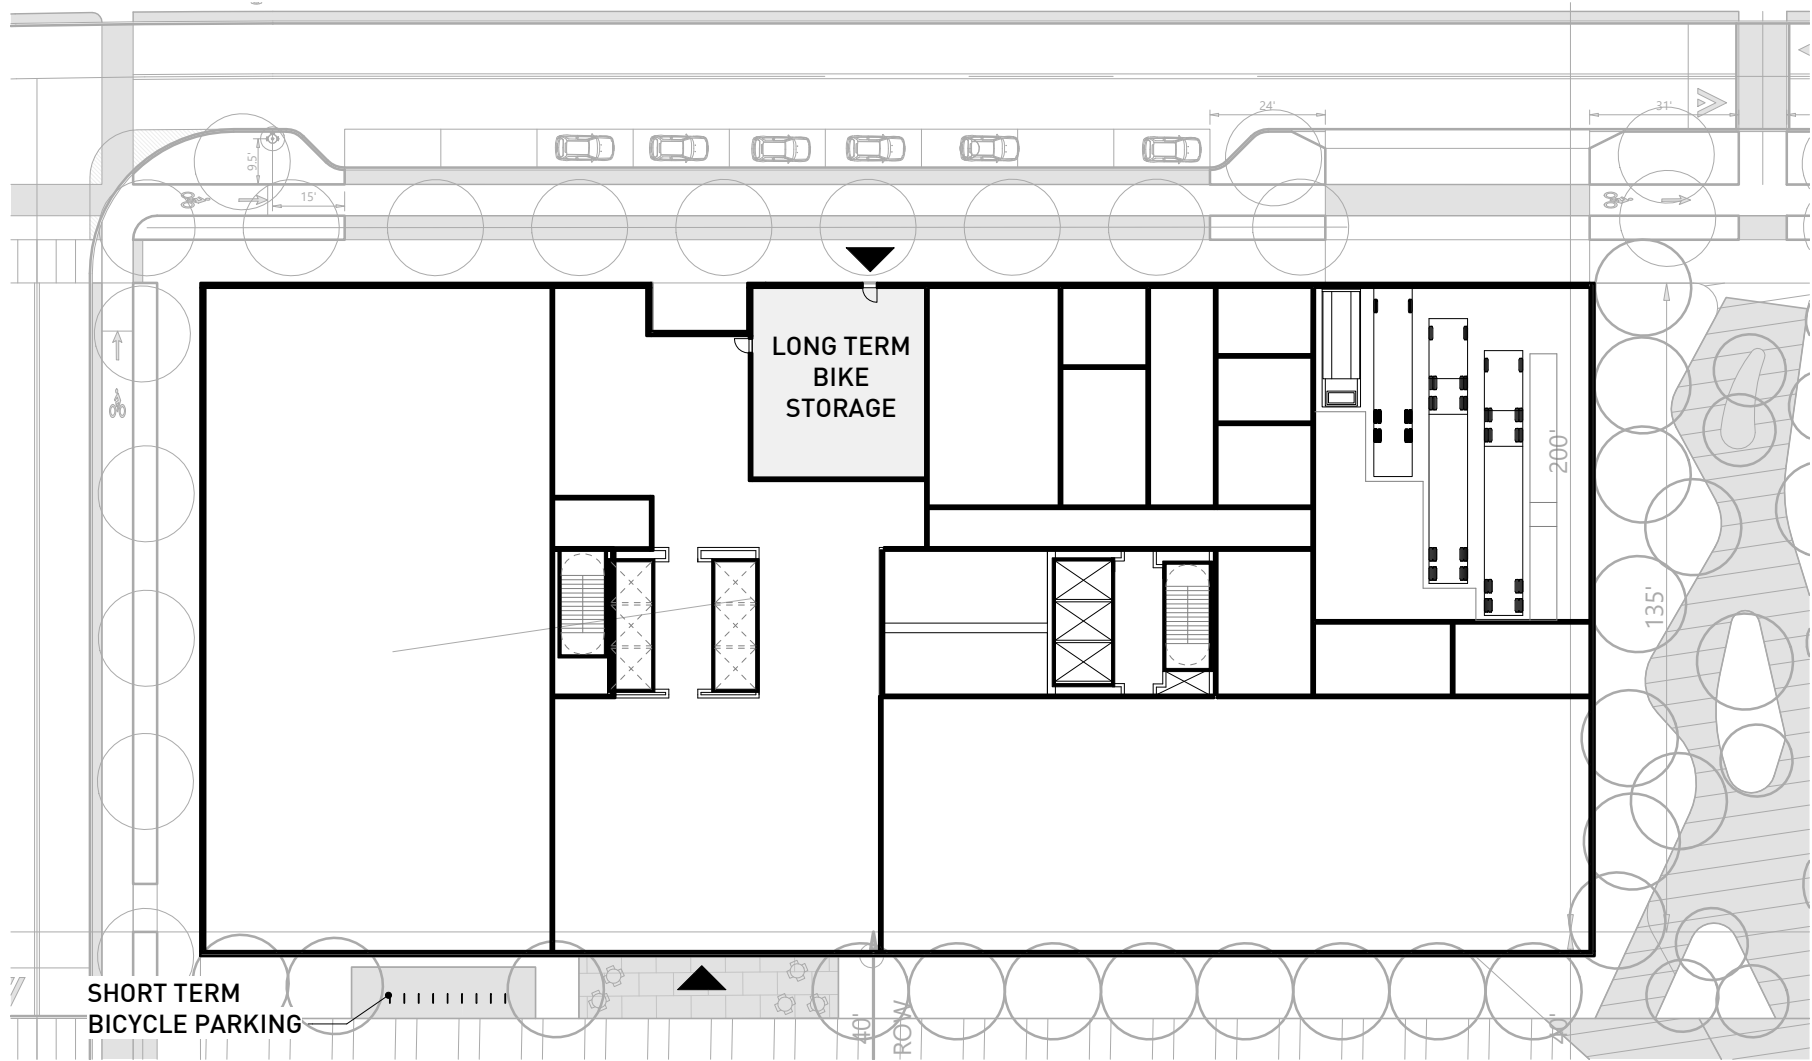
Proposed Bicycle Parking Key Plan - C2
